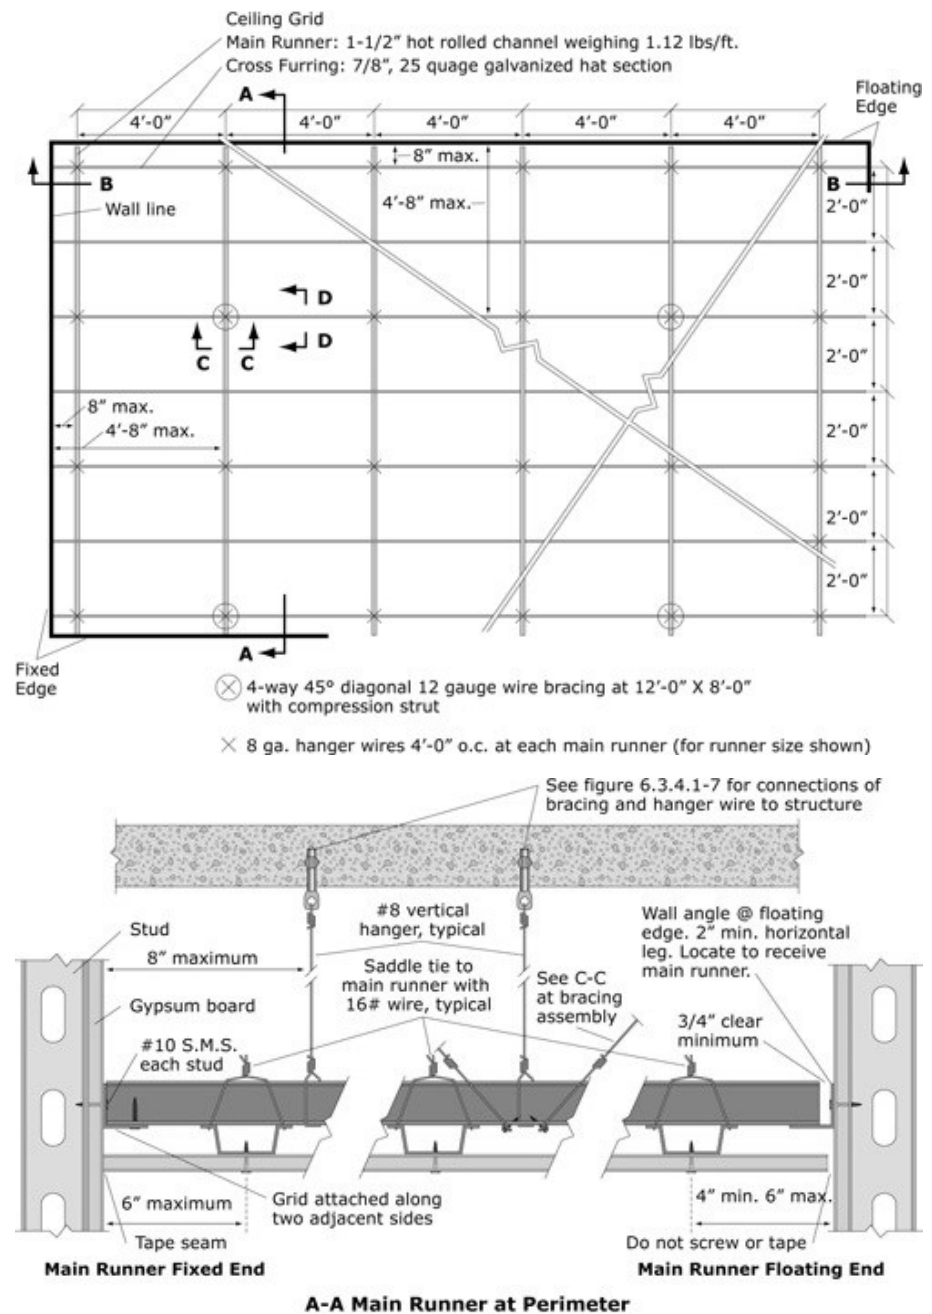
General layout, arrangement of typical seismic bracing assemblies and perimeter details for suspended lightweight steel gypsum board ceiling (FEMA, 2011)
